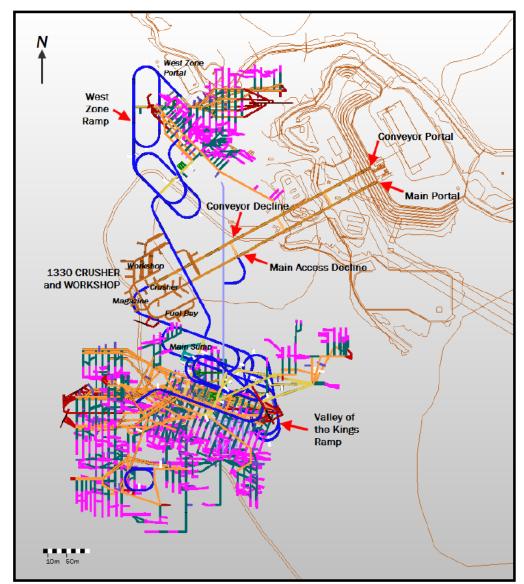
Mine Development and Infrastructure, Plan View (Tetra Tech, 2013)
